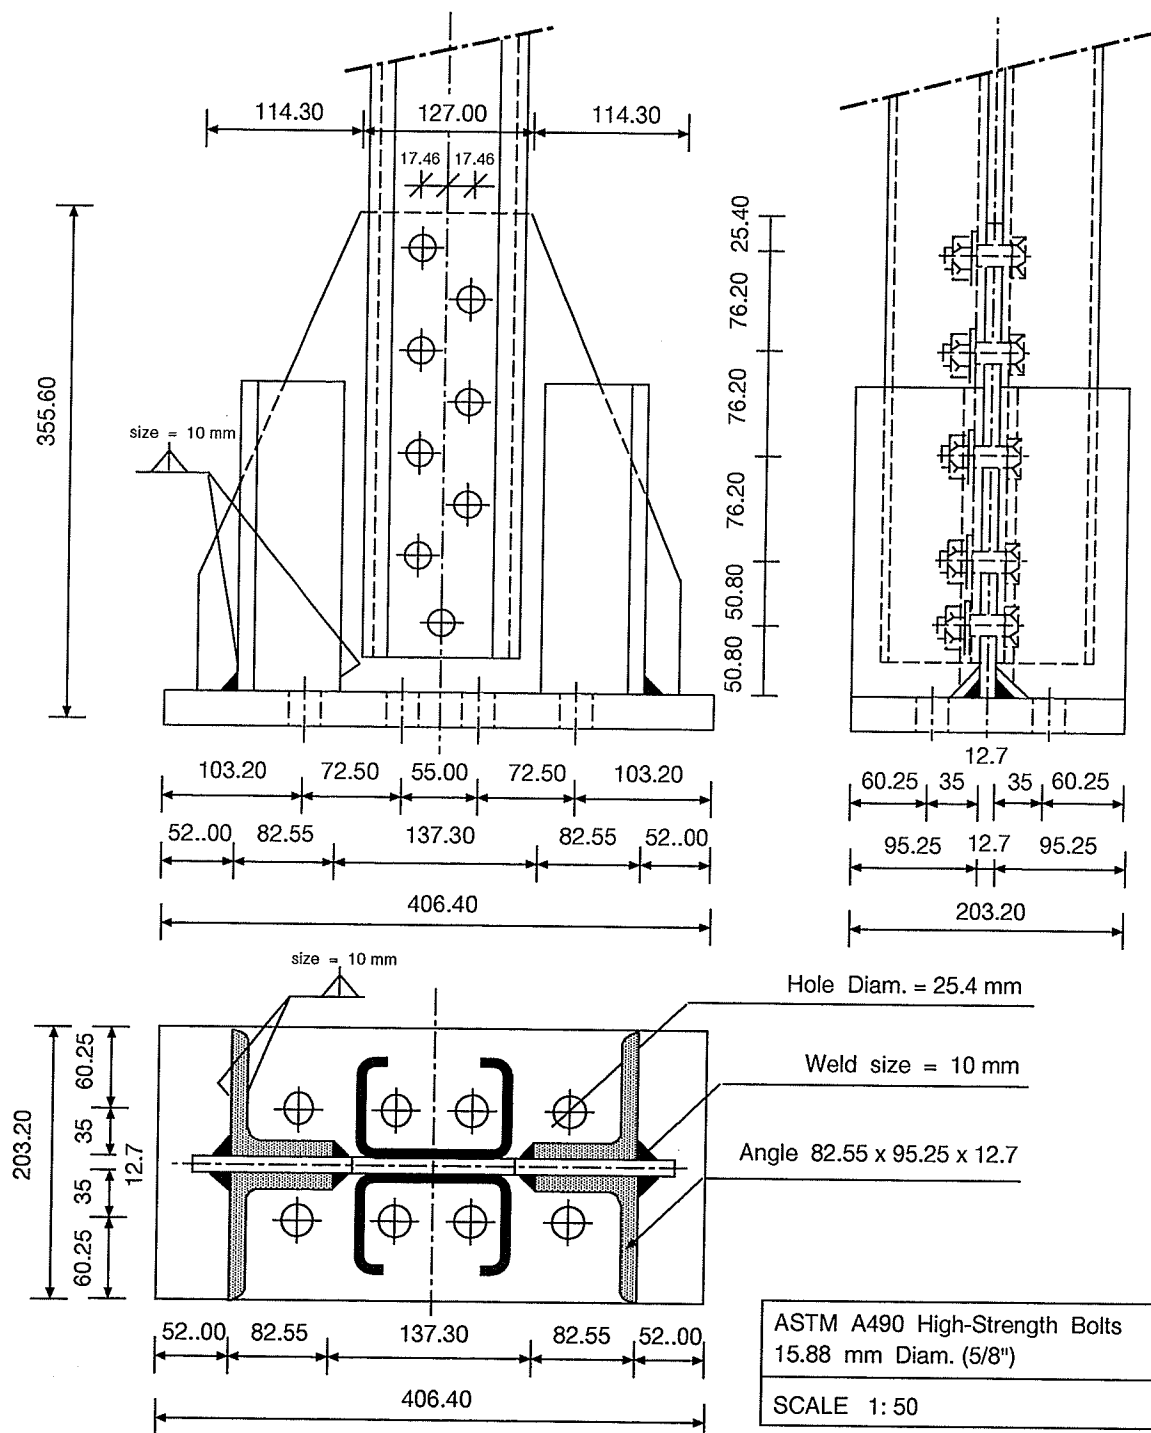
Connection Type "F" Used with Test Setup # 1.
